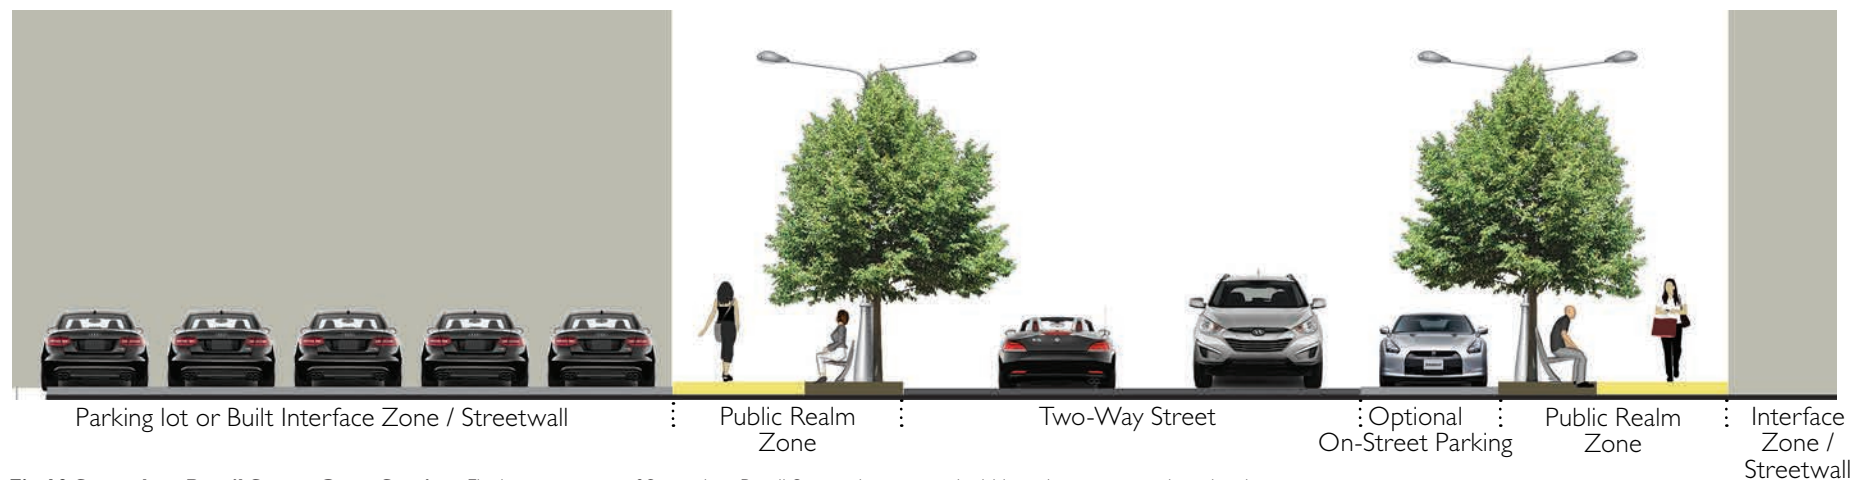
Primary Retail Street Cross Section: Final arrangement of Primary Retail Street elements and width at the transportation planning stage
